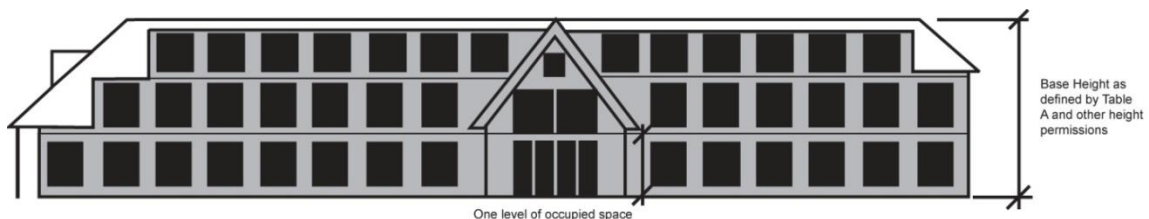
A: Existing Building Form Conforming to Base Height Limit
